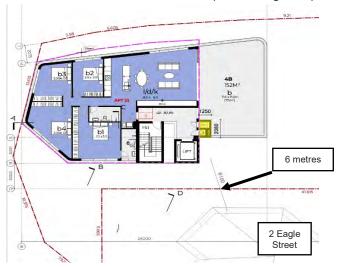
Separation to 2 Eagle Street (Source: Aleksandar Architects)
